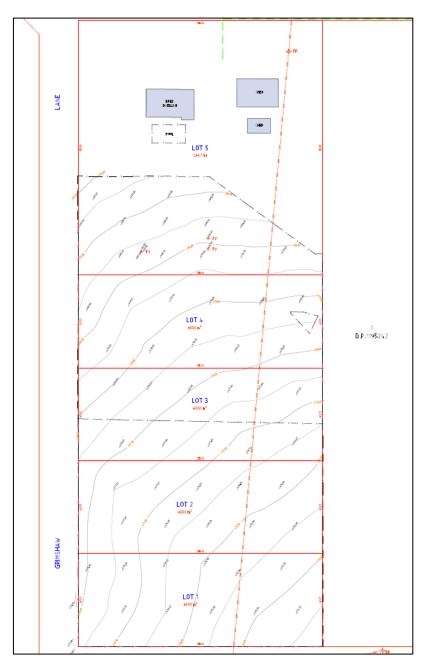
Plan of Proposed Subdivision (de Witt Consulting, 2022)
